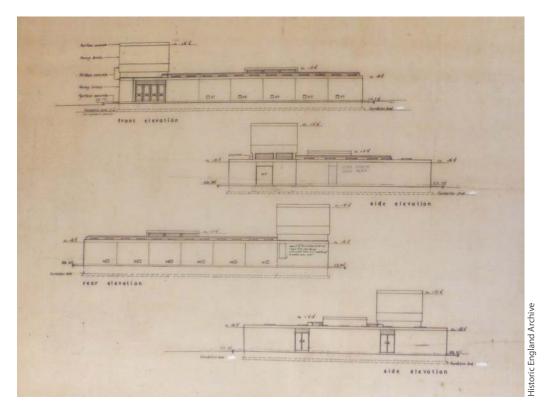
GLC elevations of the proposed changing rooms in the north-east corner of the park, c. 1970
